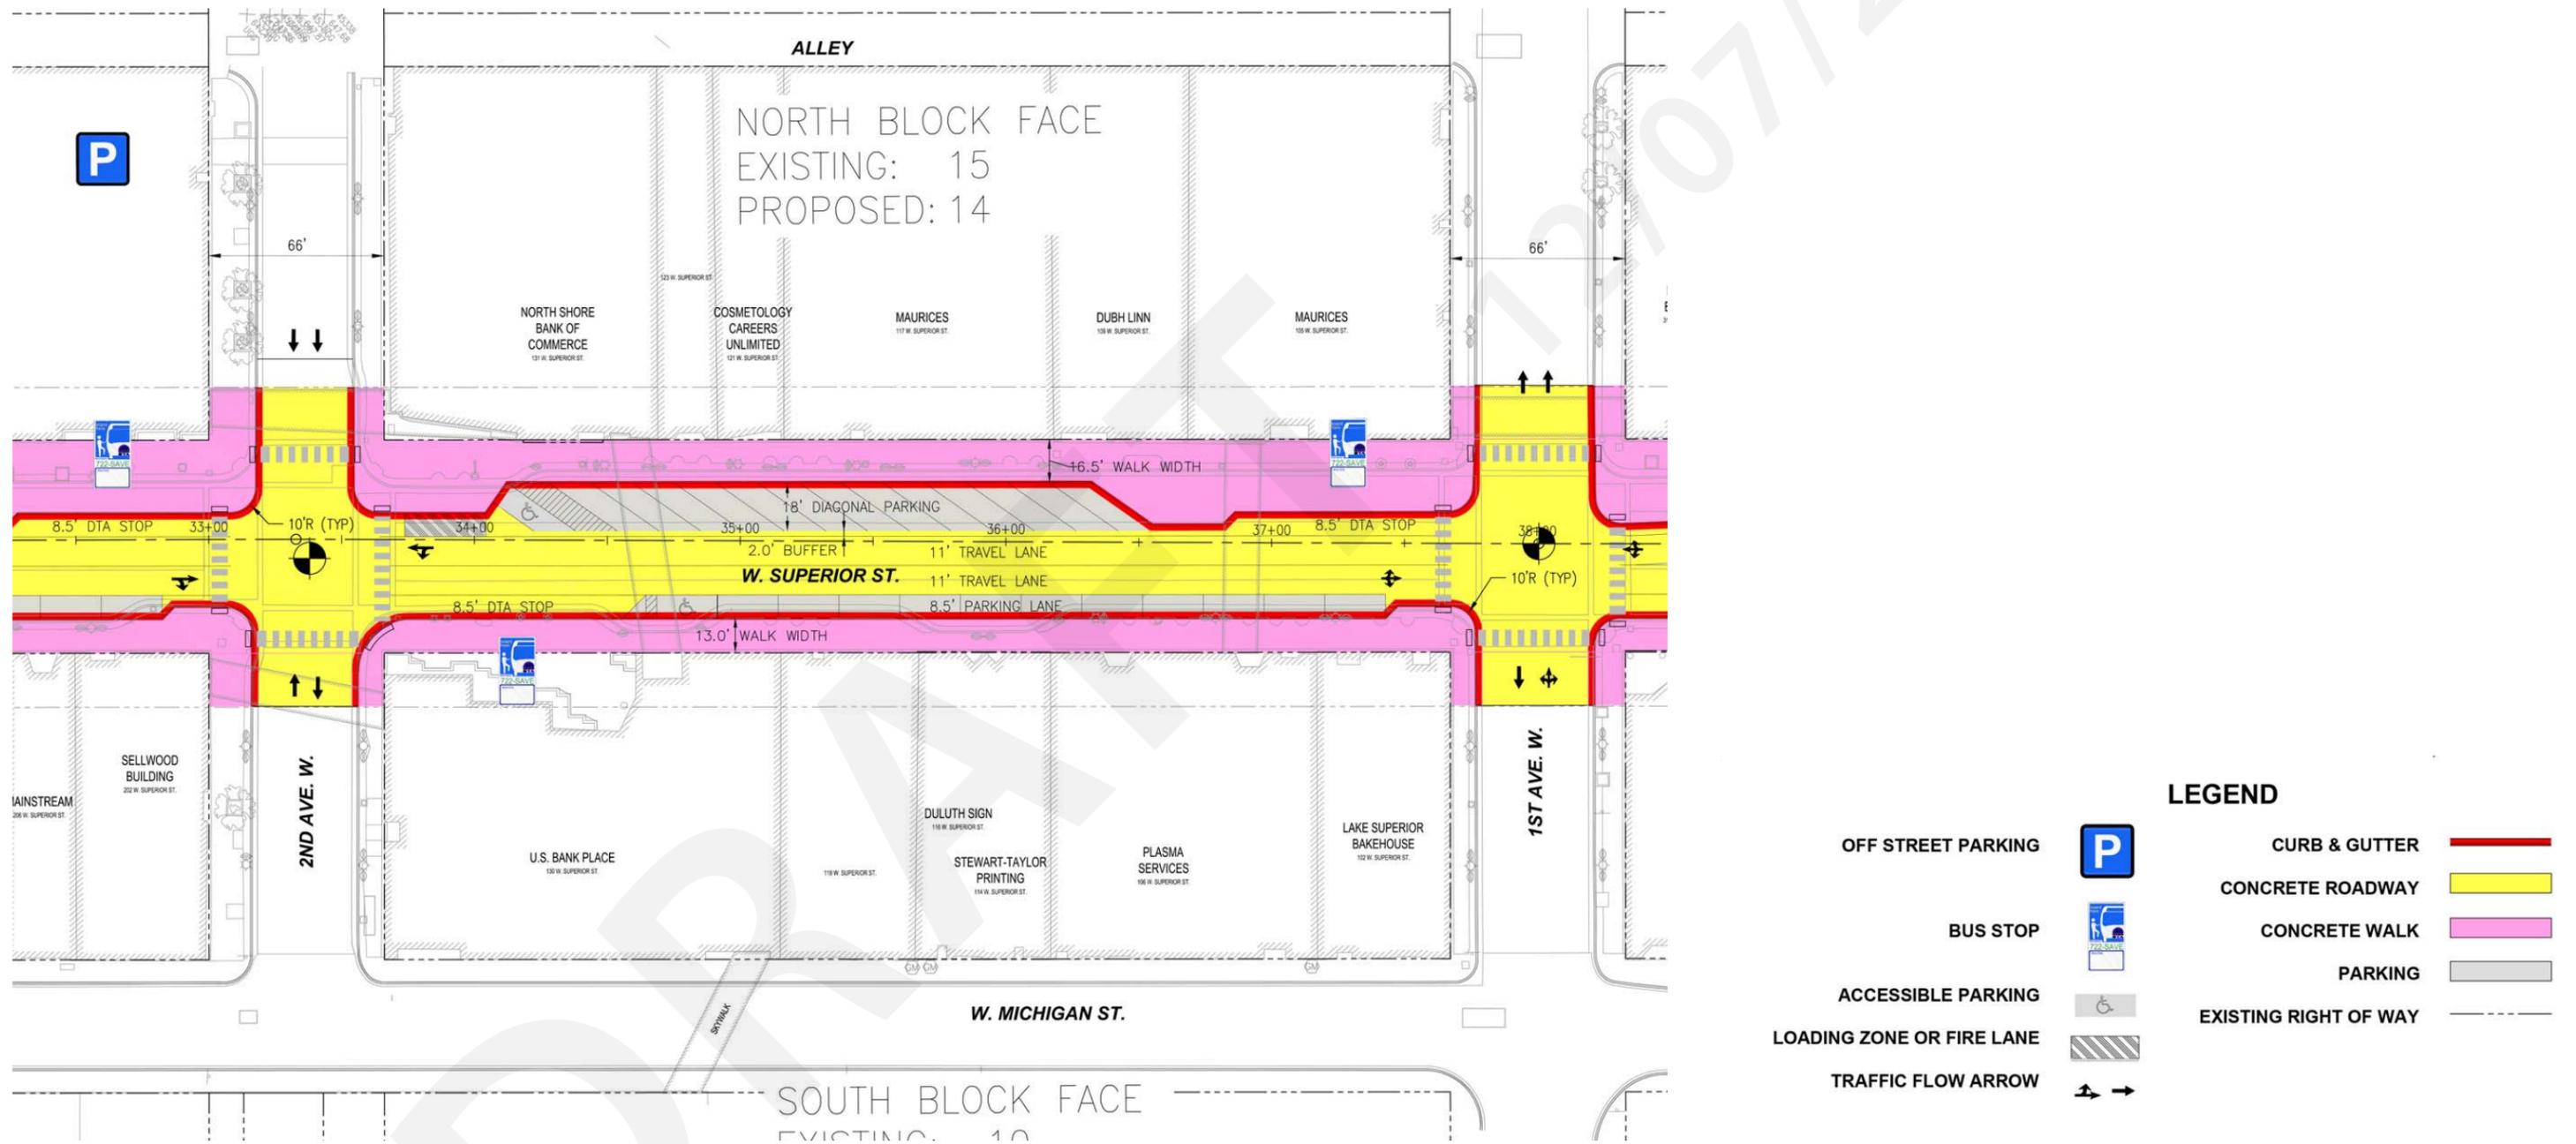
Proposed street layout between 2nd Avenue West and 1st Avenue West.
